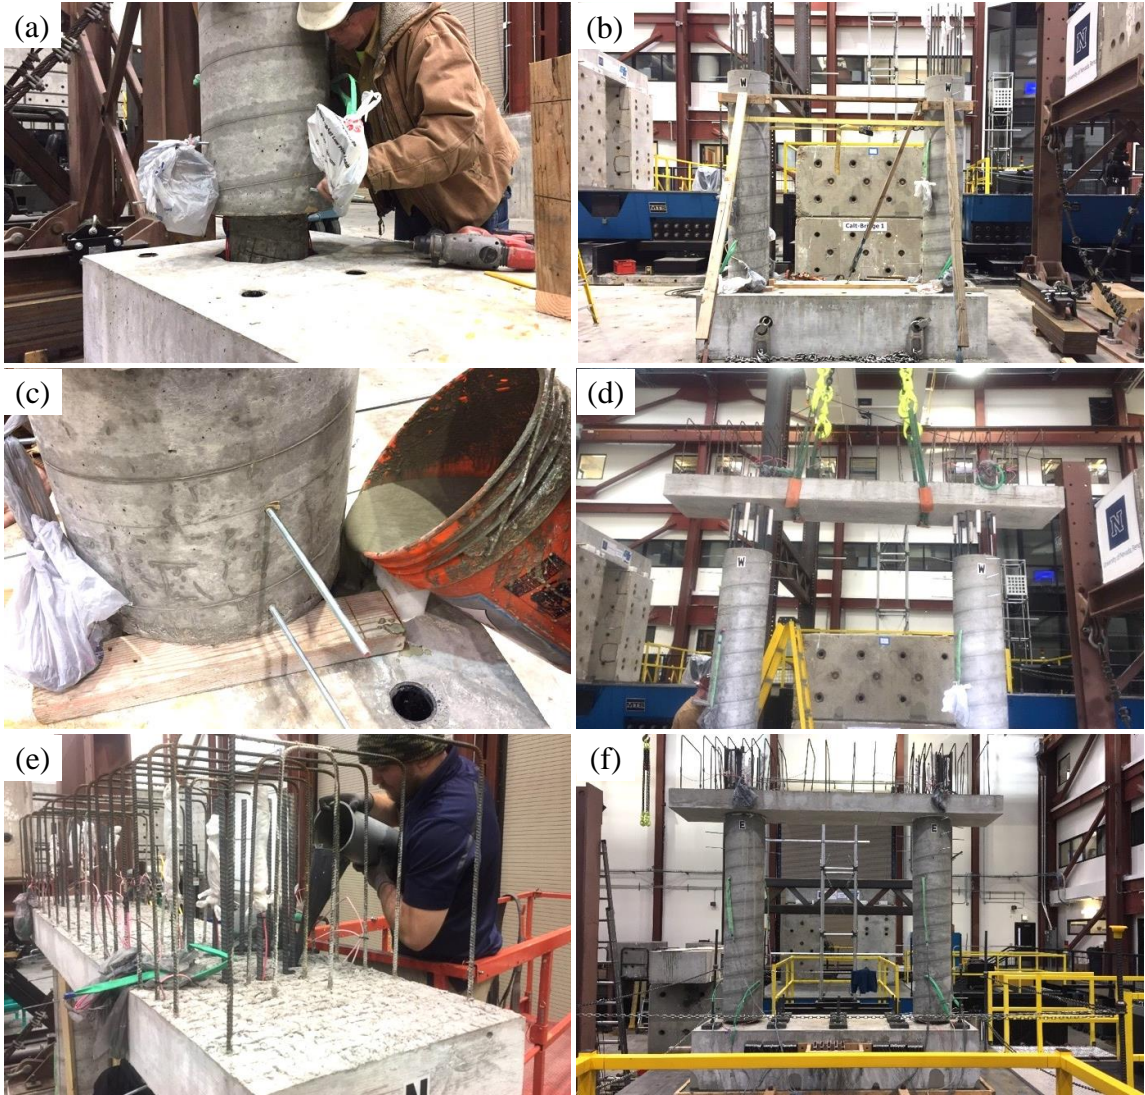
(a) Inserting column into the footing, (b) Securing columns temporarily, (c) Grouting the spacing between the column and the footing, (d) placing precast cap beam on the columns, (e) Grouting cap beam ducts, (f) Precast bent on the shake table (Images by Elmira Shoushtari)
